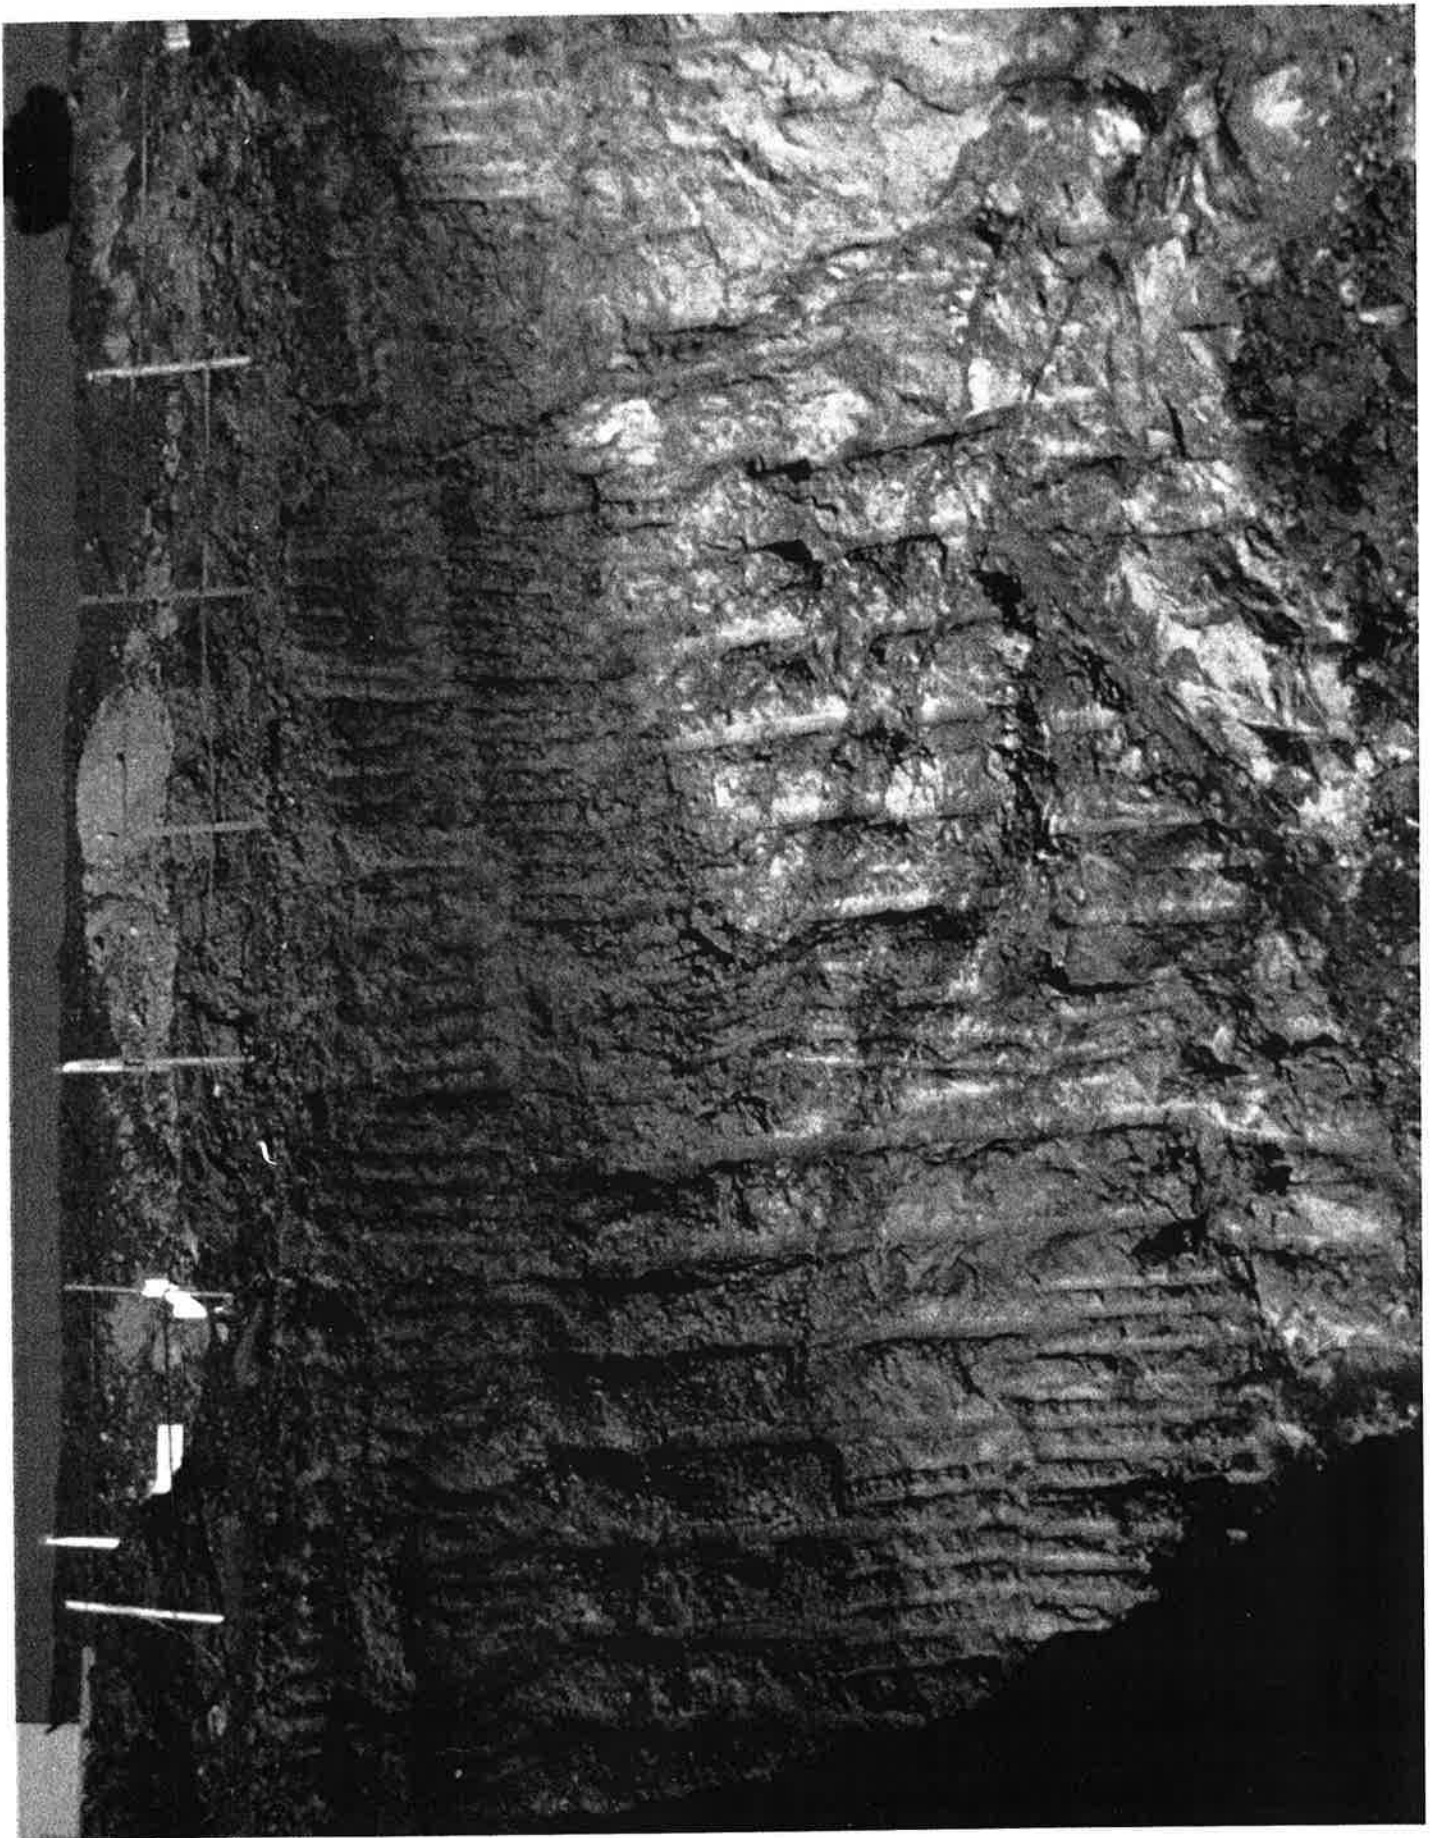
Photo by Frank Denison, 1985, of faulted old alluvium in north wall of library foundation excavation, western UCLA campus.
